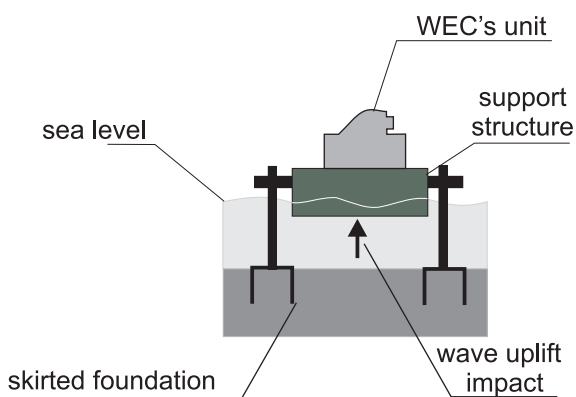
Sketch of a WEC-supporting structure with skirted foundations
